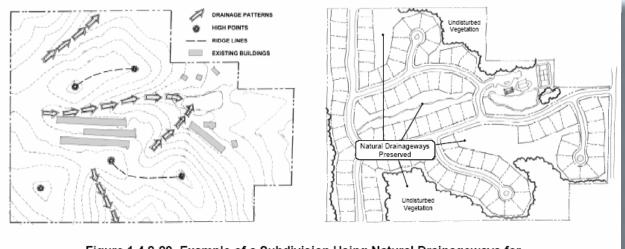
Example of a Subdivision Using Natural Drainageways for Stormwater Conveyance and Management
